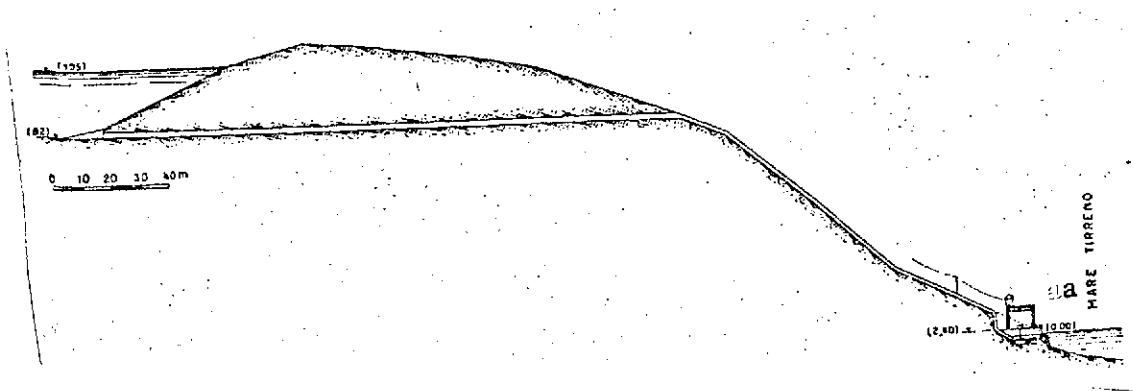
Full pipe conduit in the first solution (bay of Lazzaretto).
